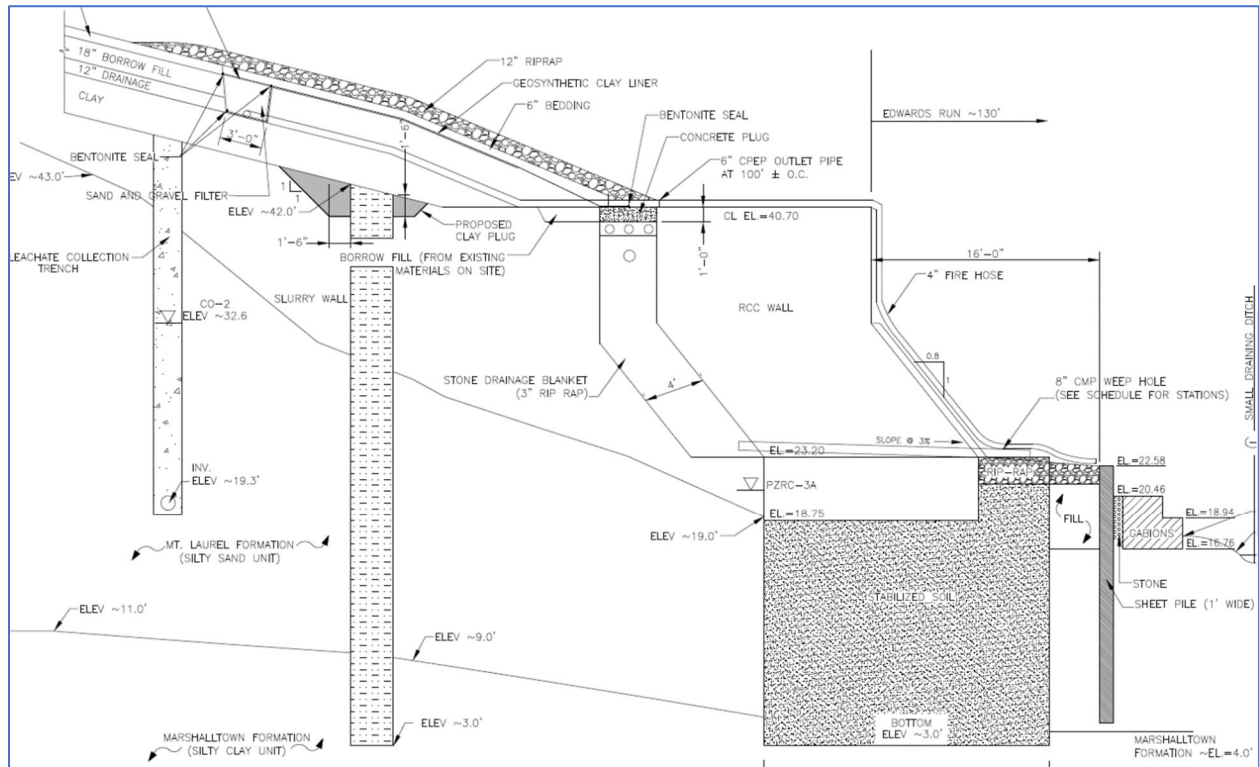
As-Built Cross Section of Slurry Wall and LCS near MW-9S (Station S54+00)
